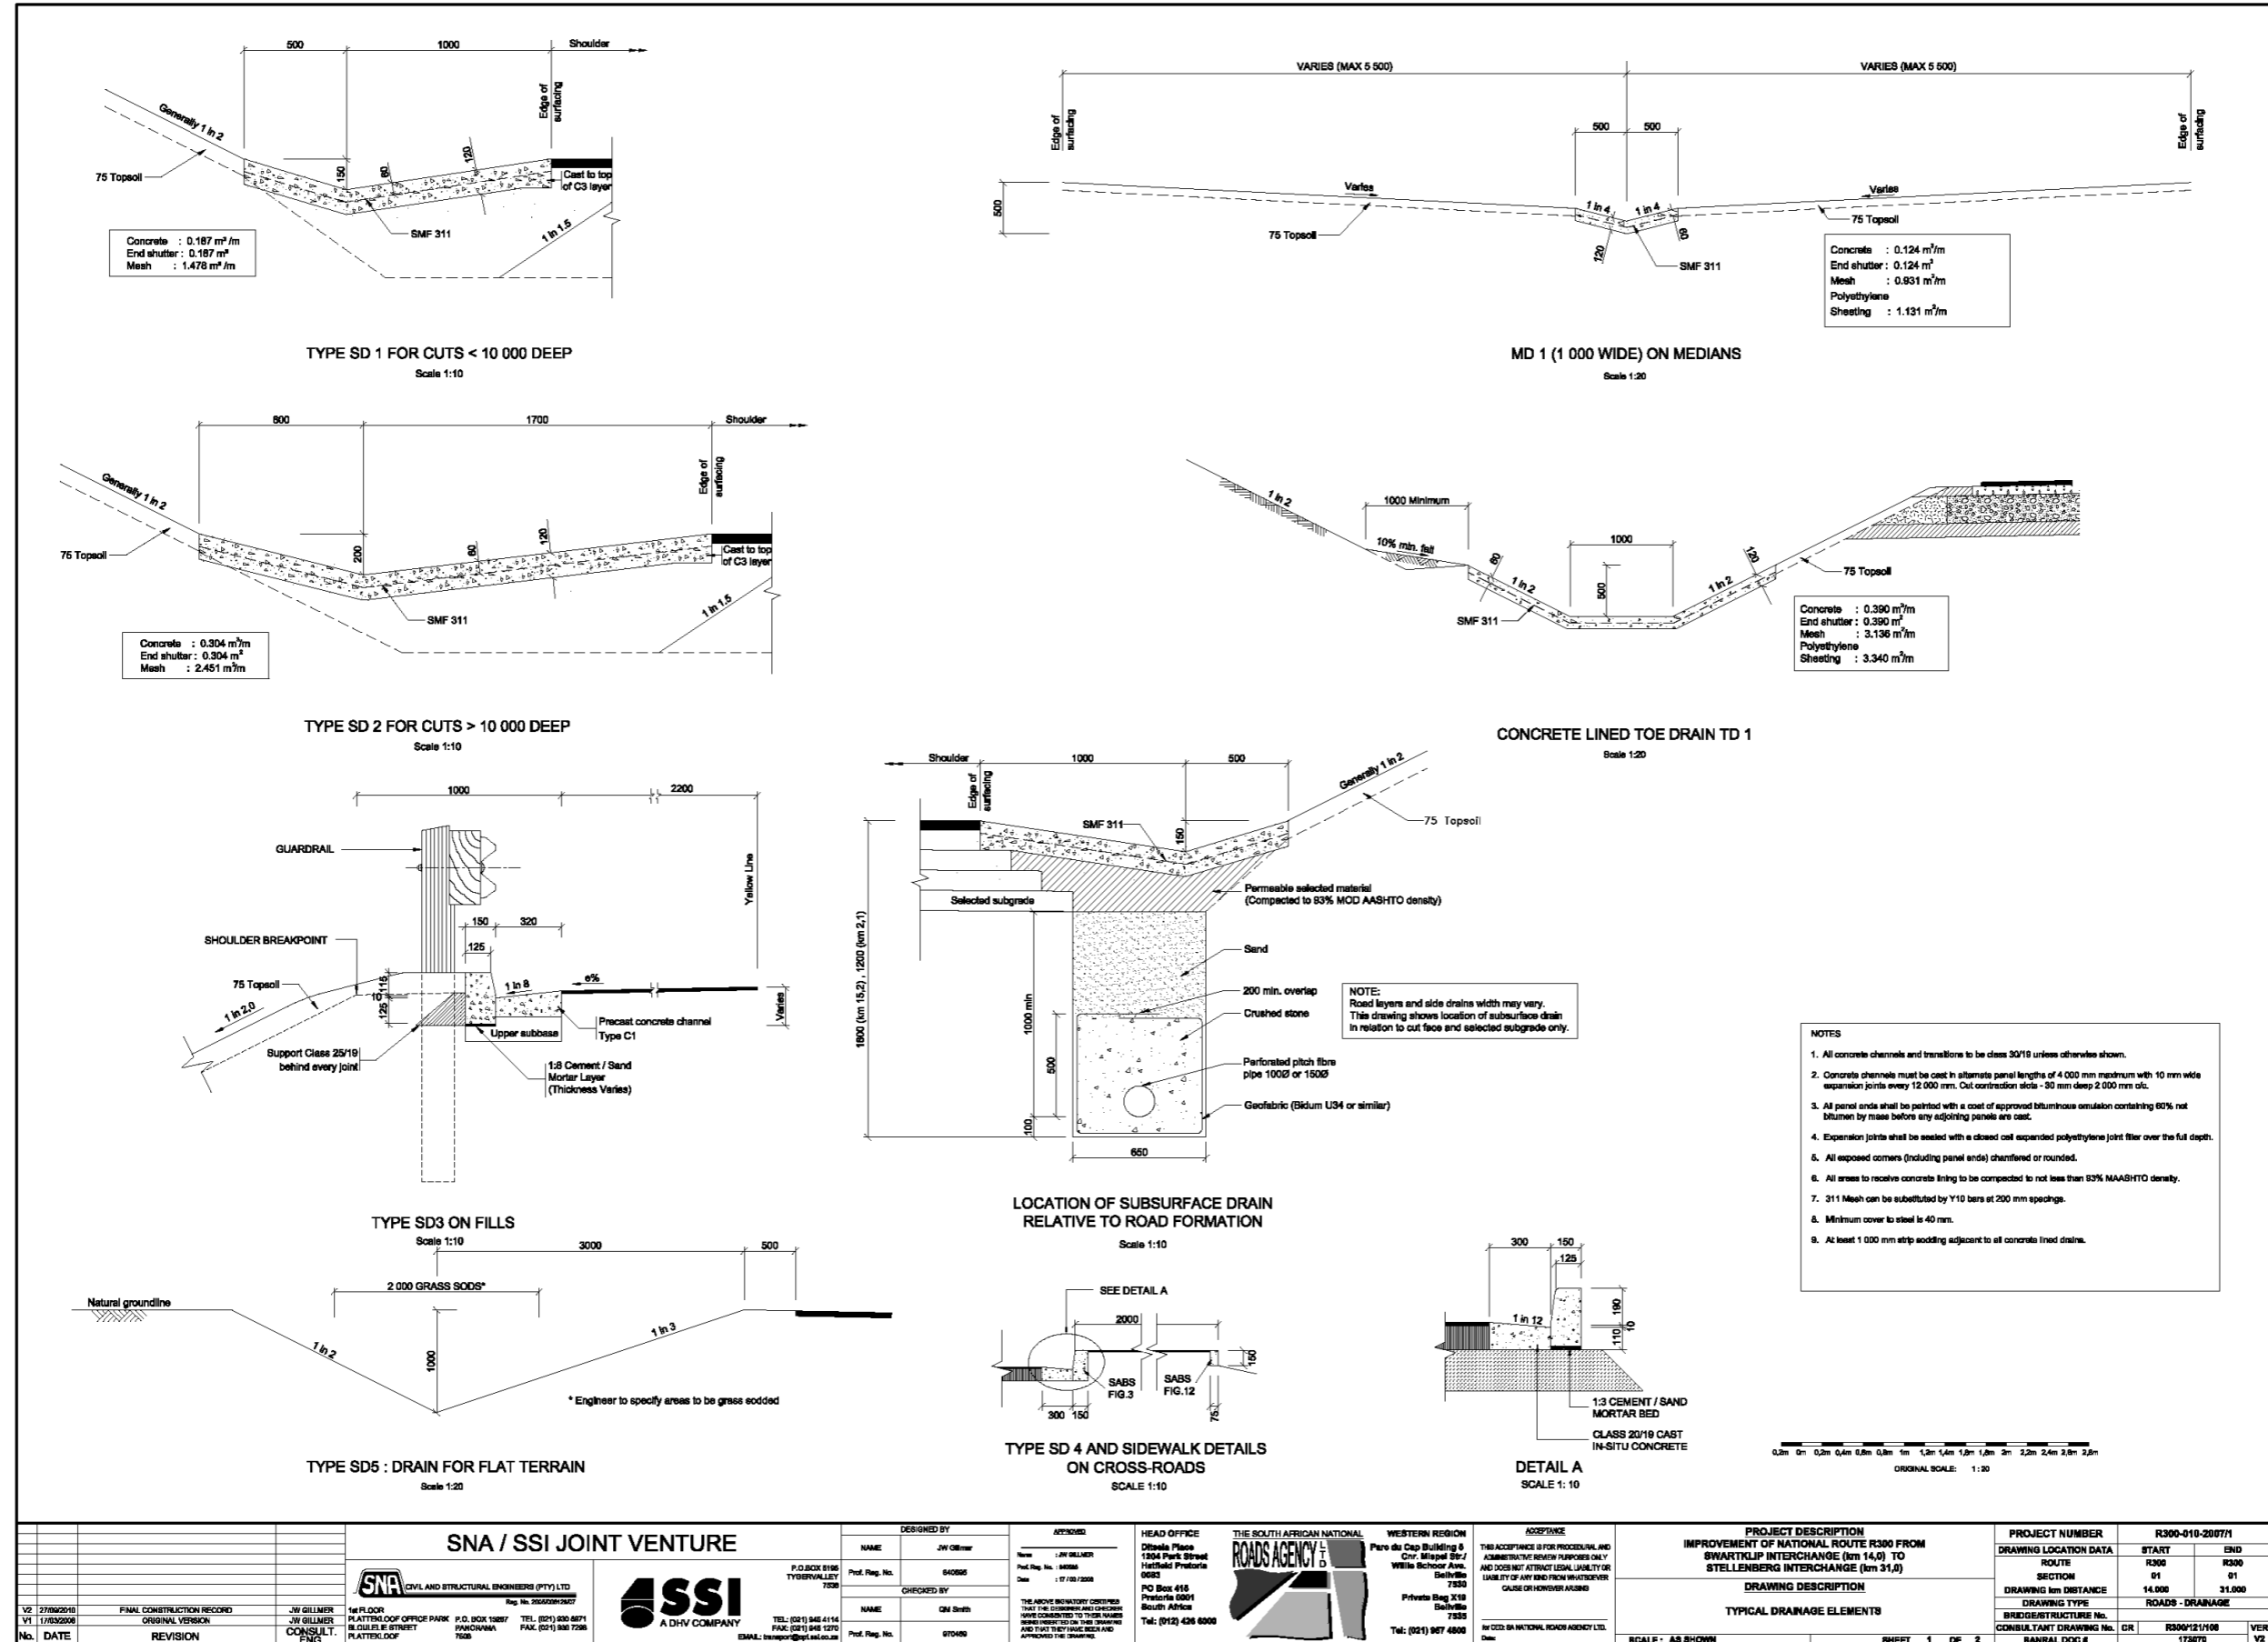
Typical drainage elements (1) (SNA-SSI Joint Venture, 2008)
